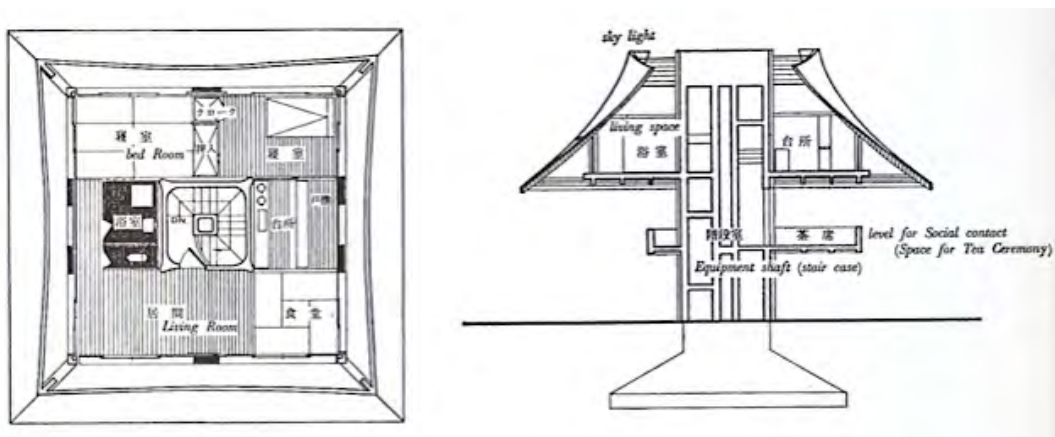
Kishō Kurokawa, *Mushroom-shaped House*, proposal for rural living, floor plan and section, (in: *Metabolism 1960*, p.79)
